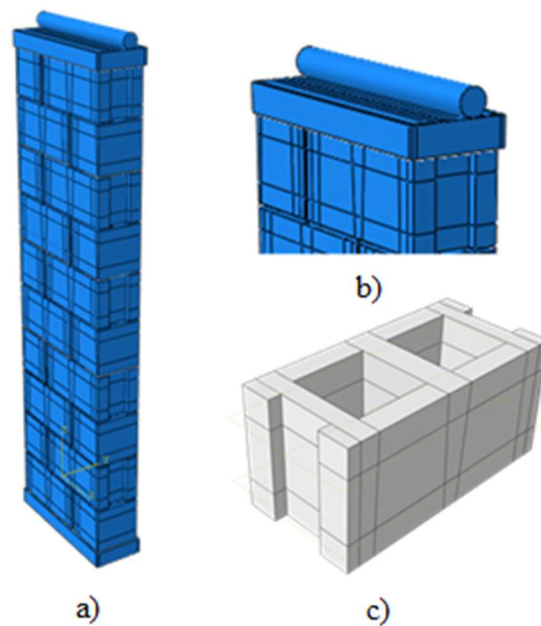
Wall Assembly Figures: a) Overall Assembly, b) Roller Used for Axial Load Application, c) Tapered Blocks Used in Wall Assembly.
